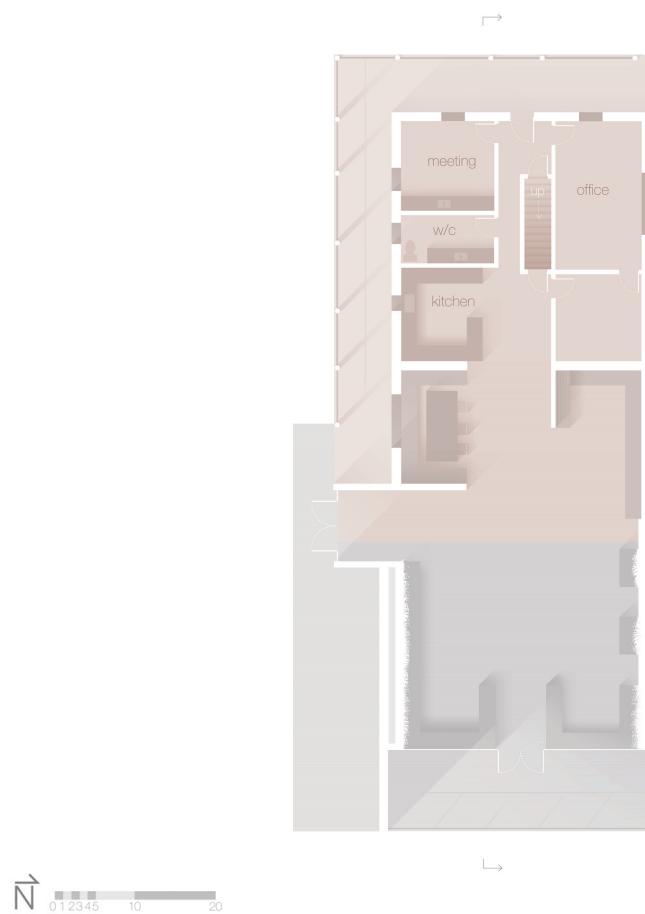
Ground floor plan (level 2) of the retreat centre, highlighting the new entryway to replace the current gazebo and the locations of the green walls as transitional elements for the addition.
